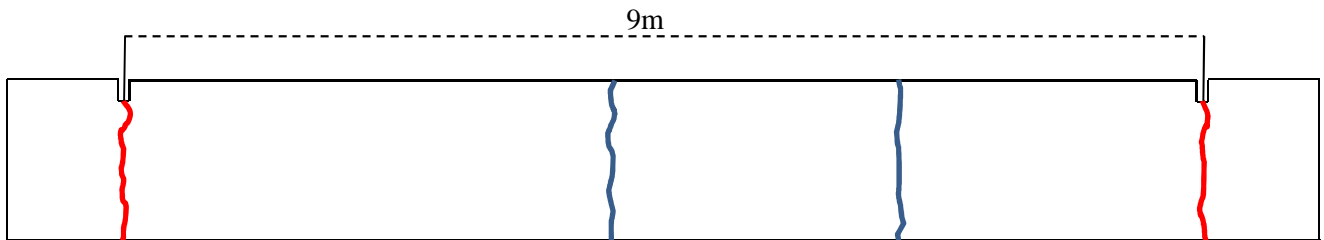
The crack pattern of a 150 mm thick 9 m joint spacing slab containing 5 kg/m³ fibres
